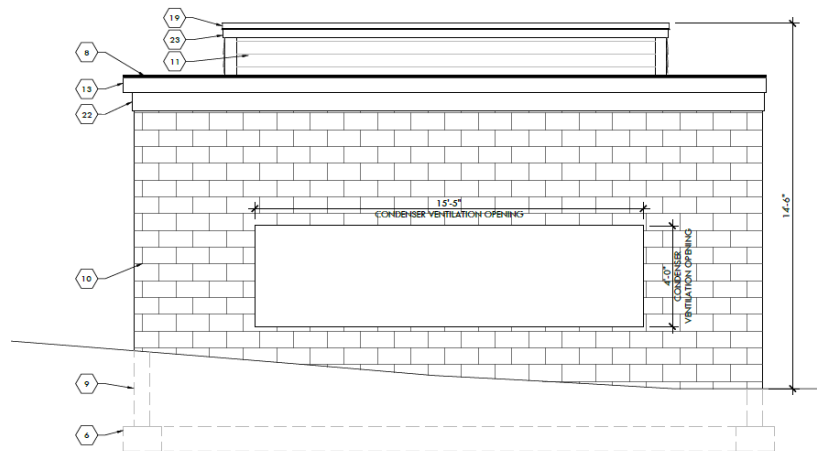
West elevation of the proposed structure showing the opening facing the existing building.
